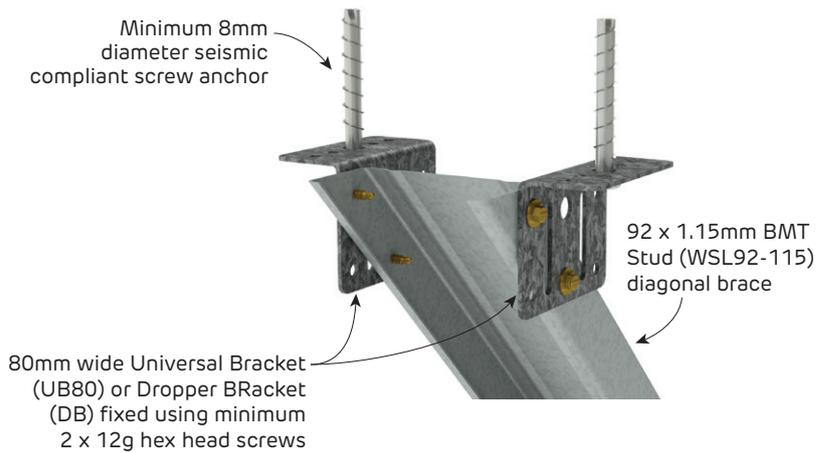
Alternative Diagonal Brace Soffit Connection
